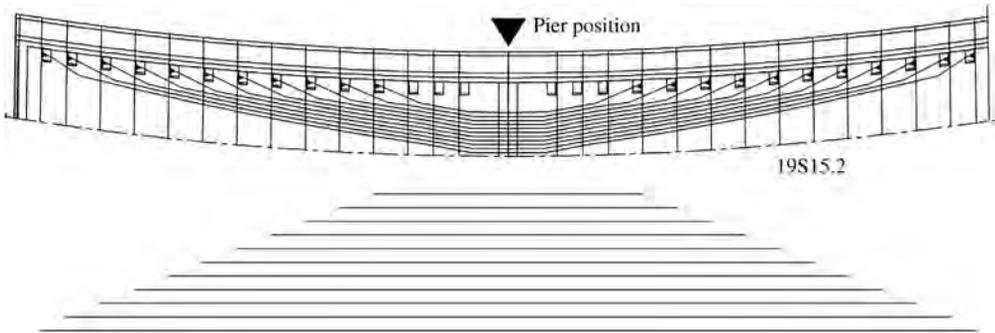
Cantilevering tendon layout of Extradosed Bridge (plan view of half top slab)
